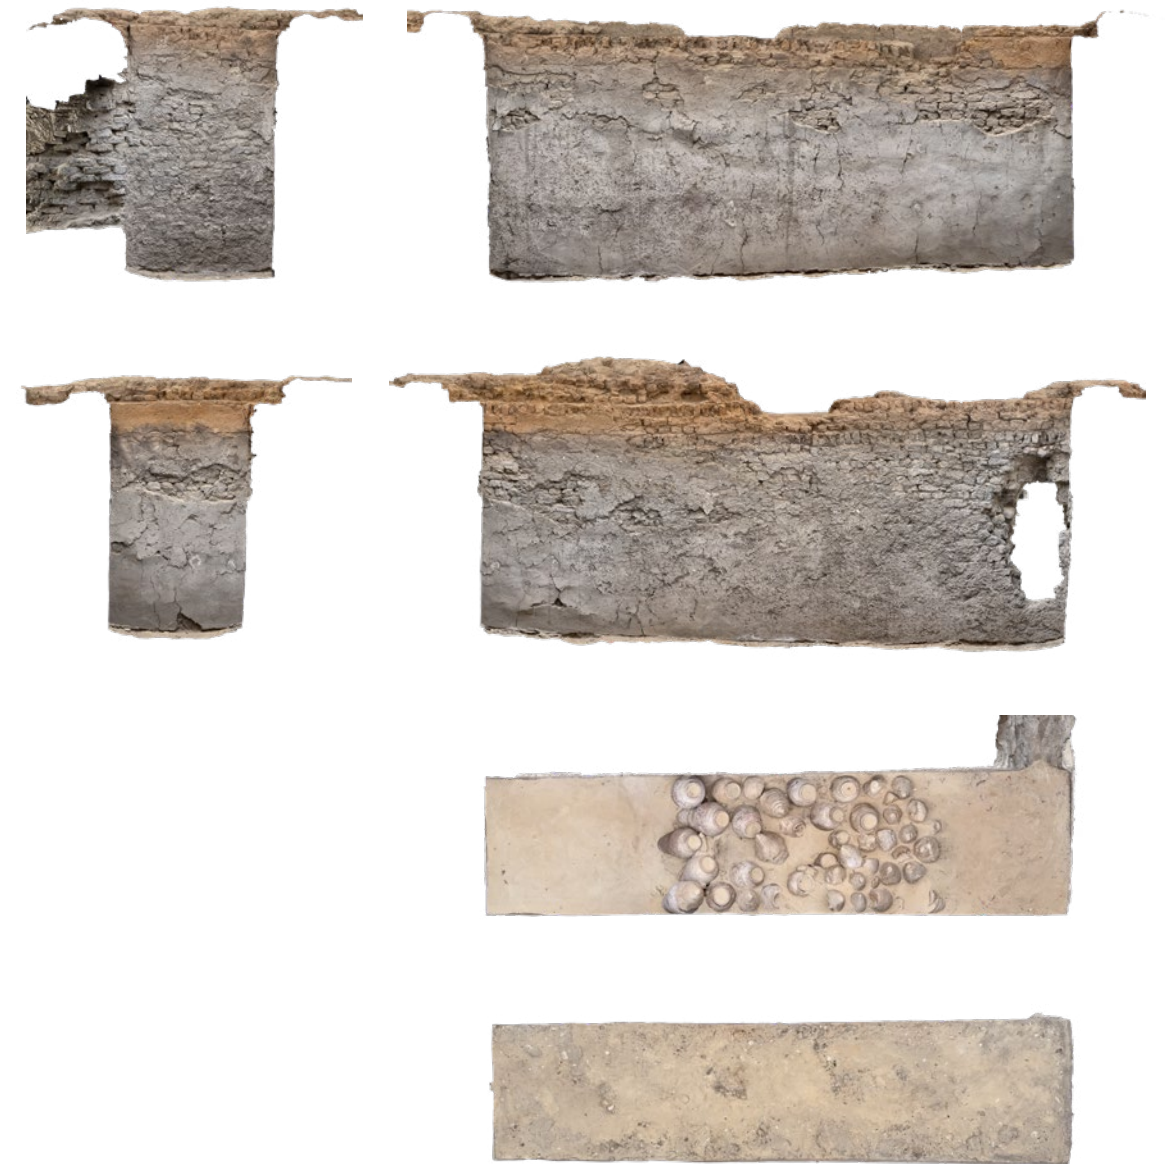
Starting from top left: south wall, east wall, north wall, west wall, midway floor, floor, orthoprojections realized by F. Sövegjarto
